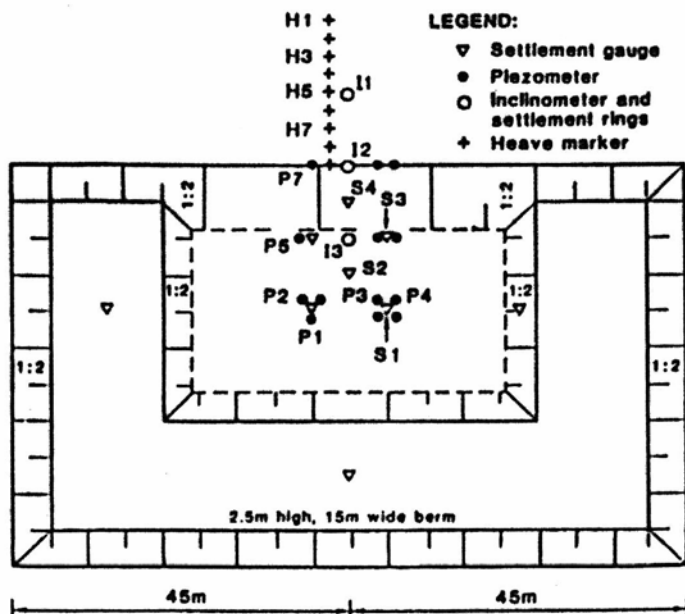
Plan of the Muar test embankment showing field instrumentation
